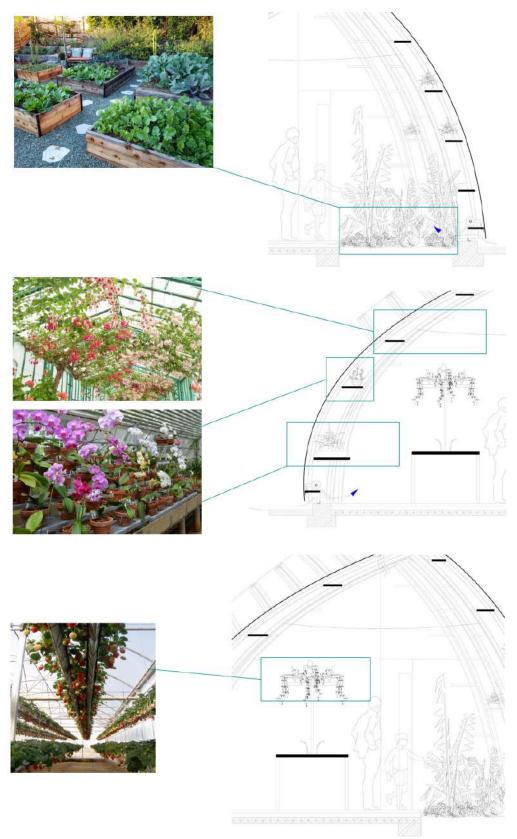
Greenhouse pavilion - plan and section - preliminary design.
